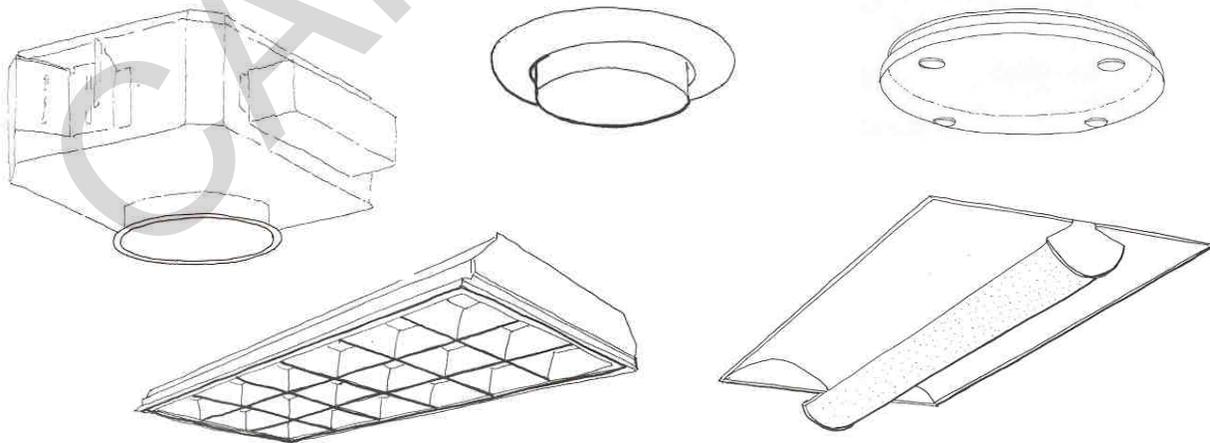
Ceiling / Surface Mounted Luminaires.
